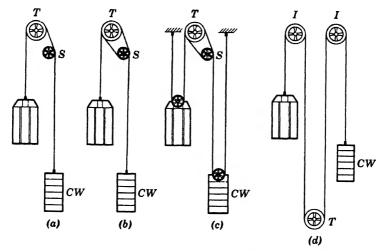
Typical elevator rope and sheave arrangements, (a), (b), and (c) for machine installed above hoistway, (d) for machine installed at the bottom of hoistway.
